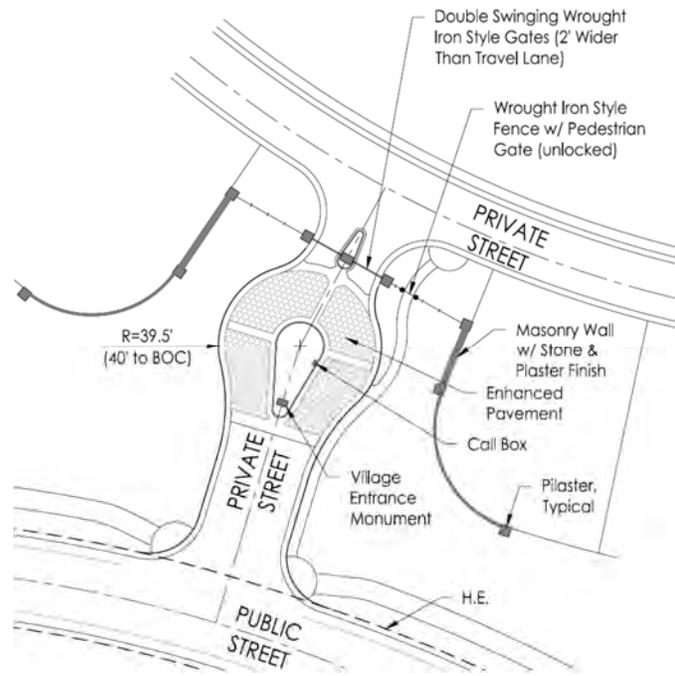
| Gated Village Entrance Typical Design (Plan View)
